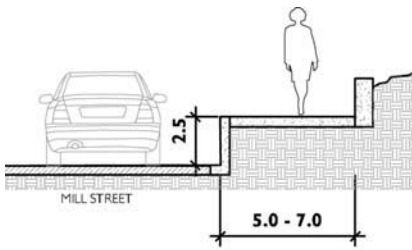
Existing Sidewalk Conditions on the East Side of Mill Street
